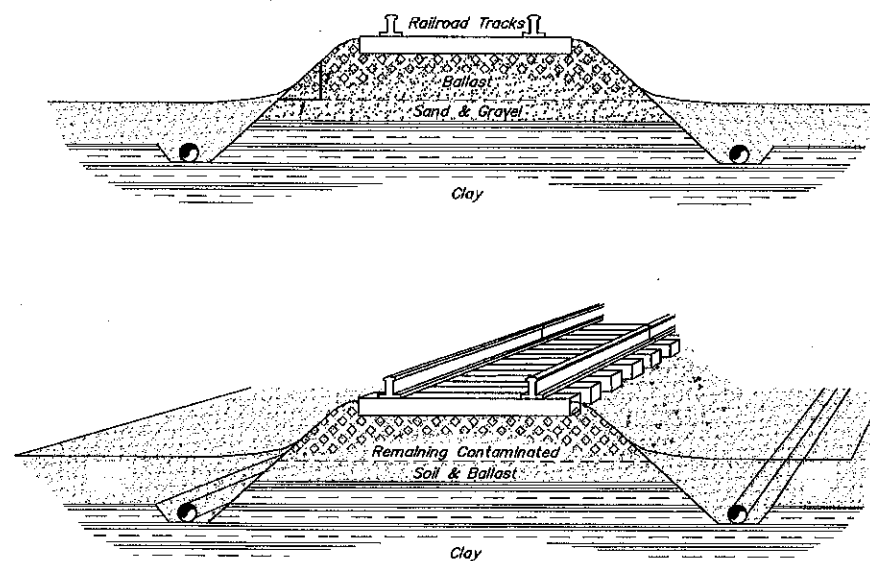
Impacted Soil to be Excavated and Drainage System Cross Section Layout
